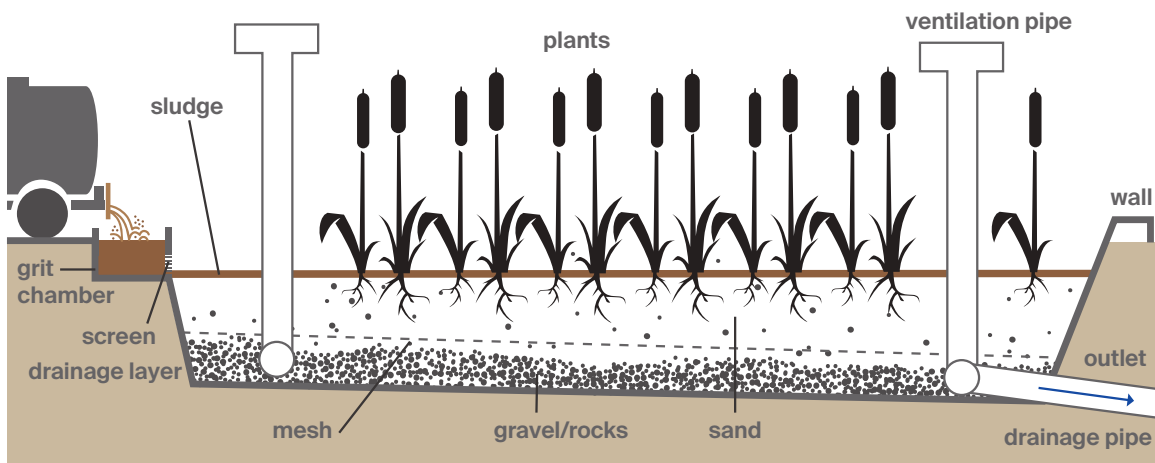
Section view of a planted sludge drying bed (adapted from Tilley, et al., 2014)
